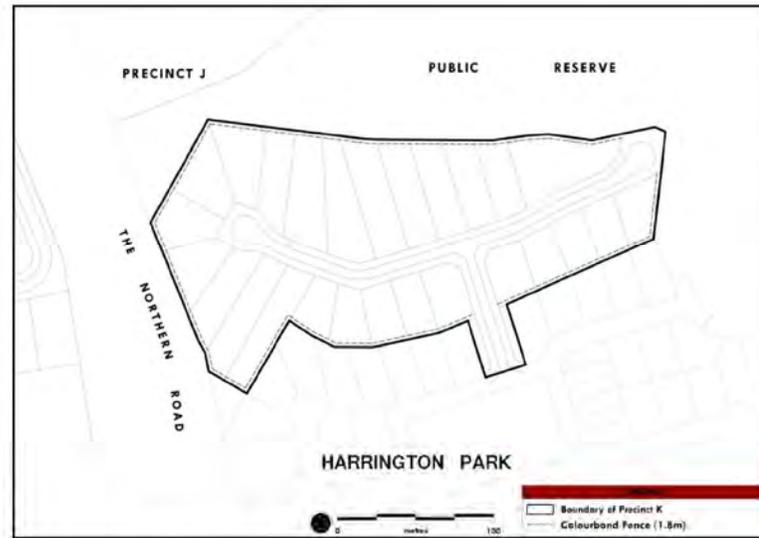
Harrington Grove Precinct K Estate Fencing Plan
